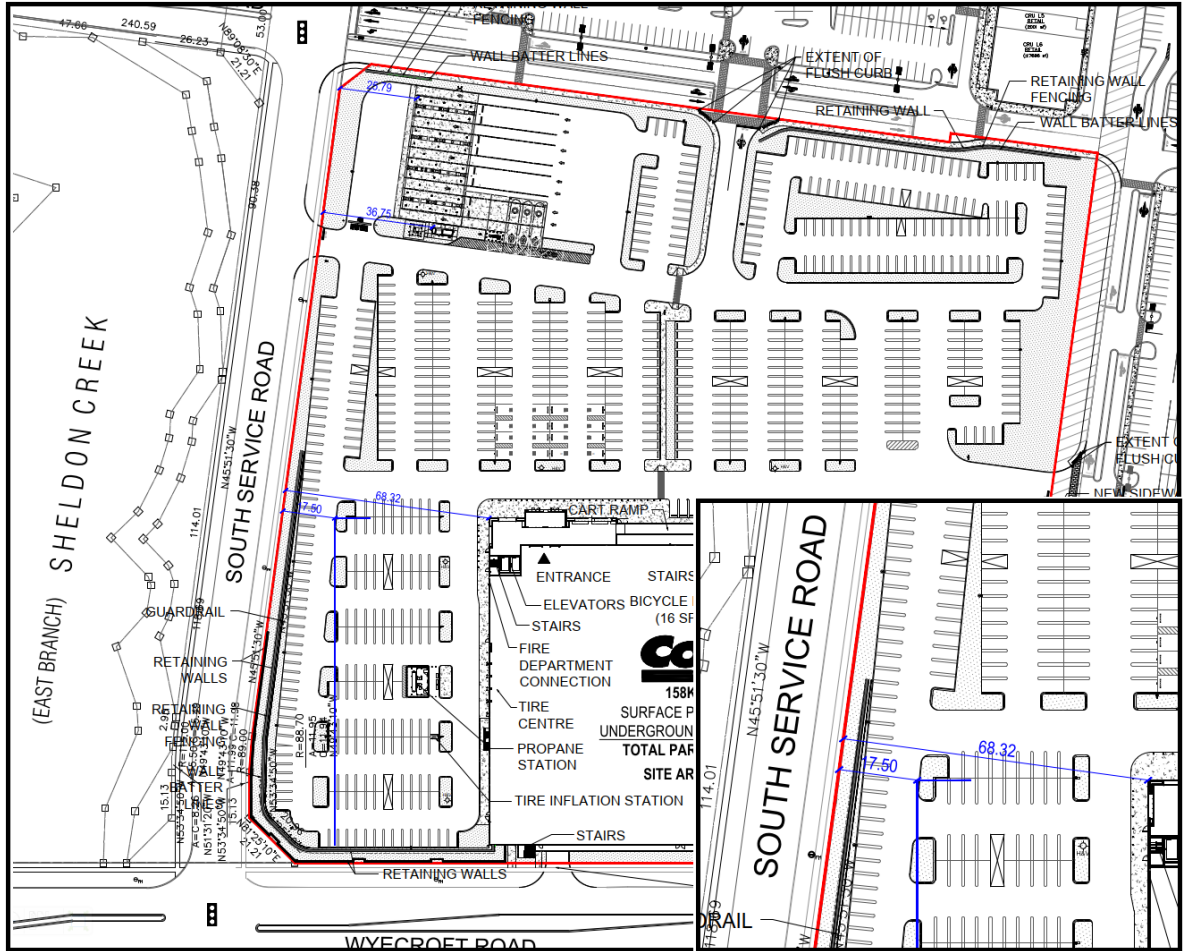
Extract from Site Plan Detailing Proposed Flankage Yard Dimensions (WSP 2024)
